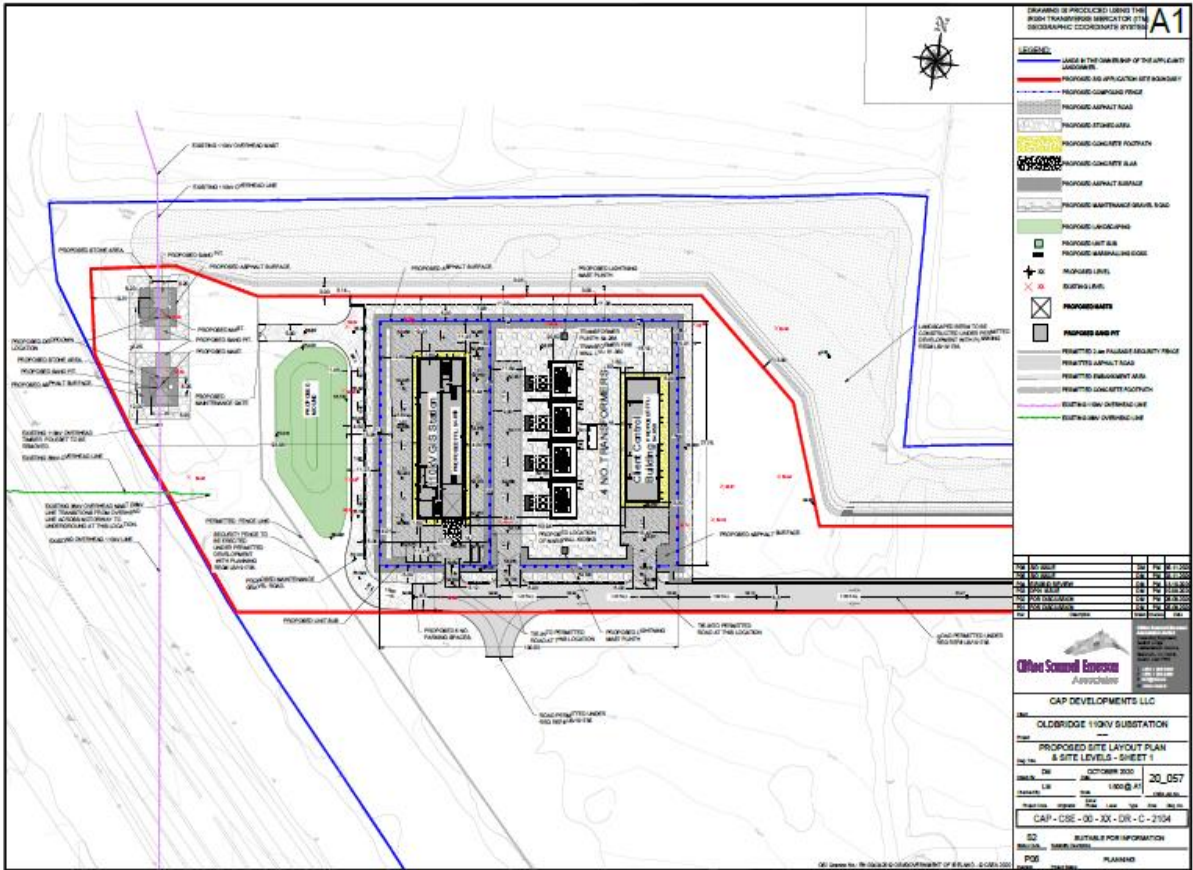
(a). Site layout plan of the Proposed Development (Source: MCA)
